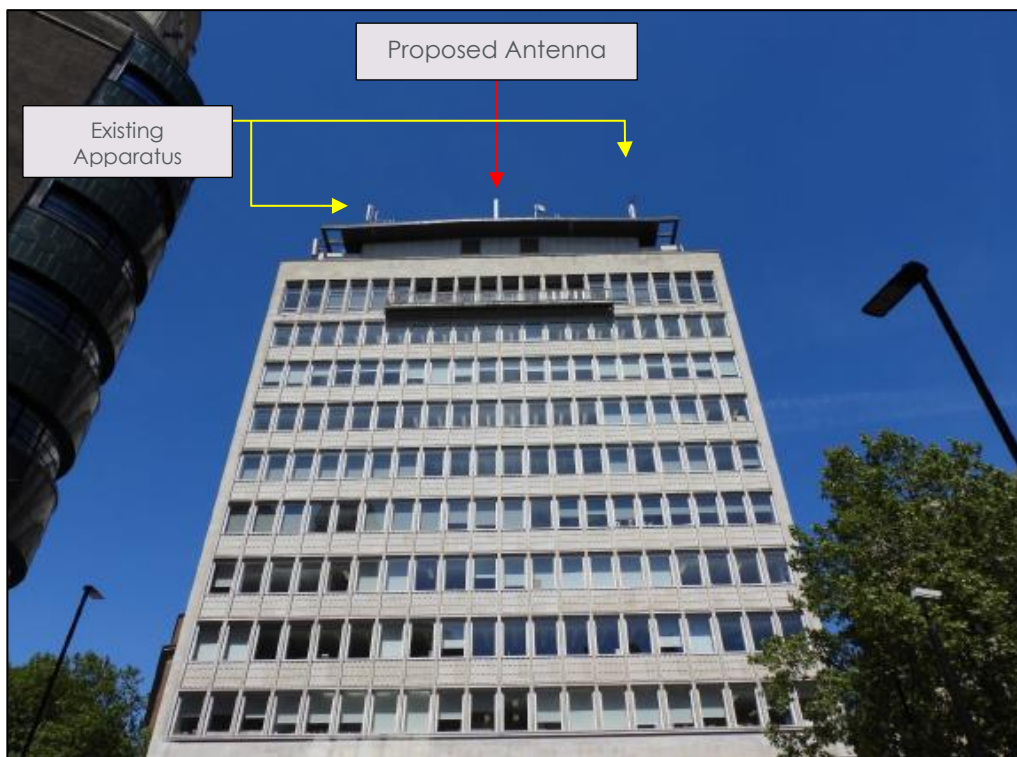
Photomontage of the proposed application site on High Holborn, facing North
